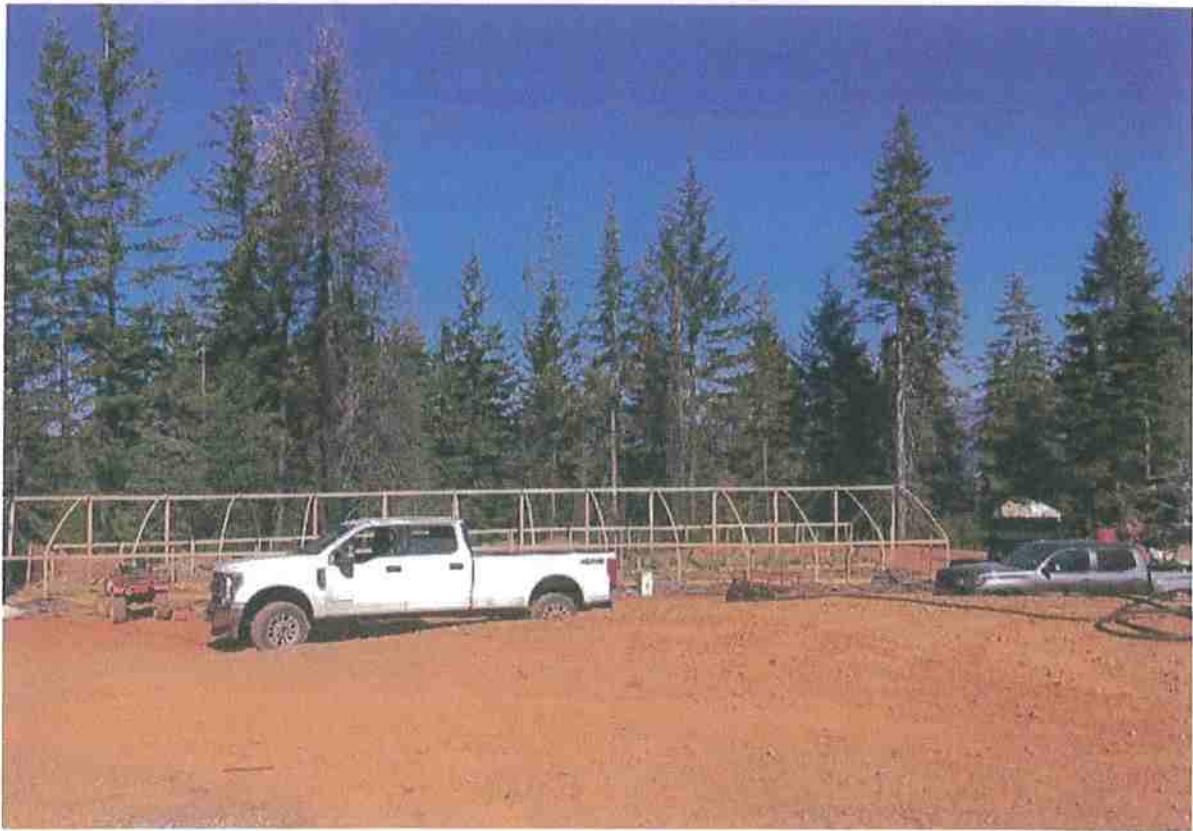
View of Cultivation Site 6, northern flat facing north.
